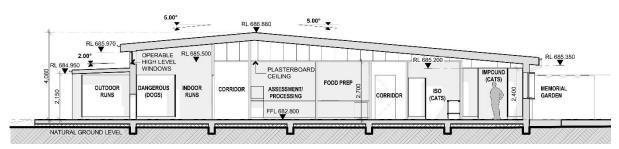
B: Animal Shelter building, Section - DA approved outdoor enclosure façade (source: F&J Tepa)
